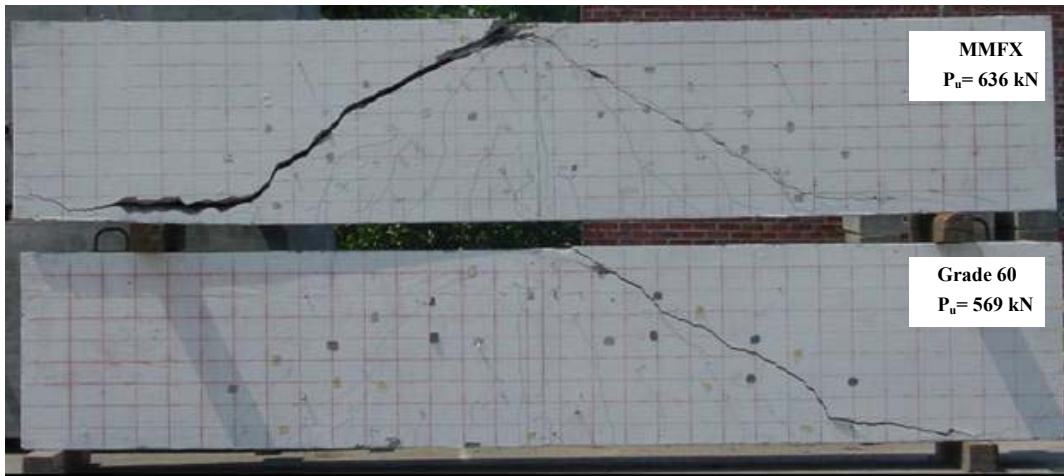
Two beams, reinforced with MMFX and grade 60 steel after failure.
